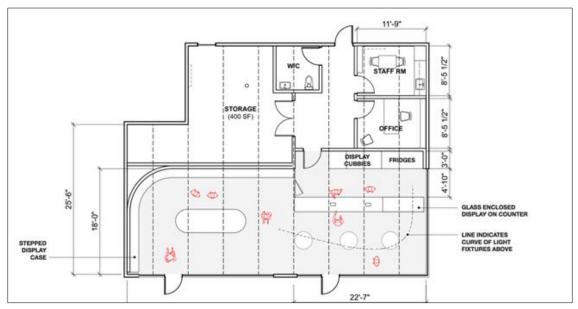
Amended Floor Plan (Unit #301 and Unit #302)
